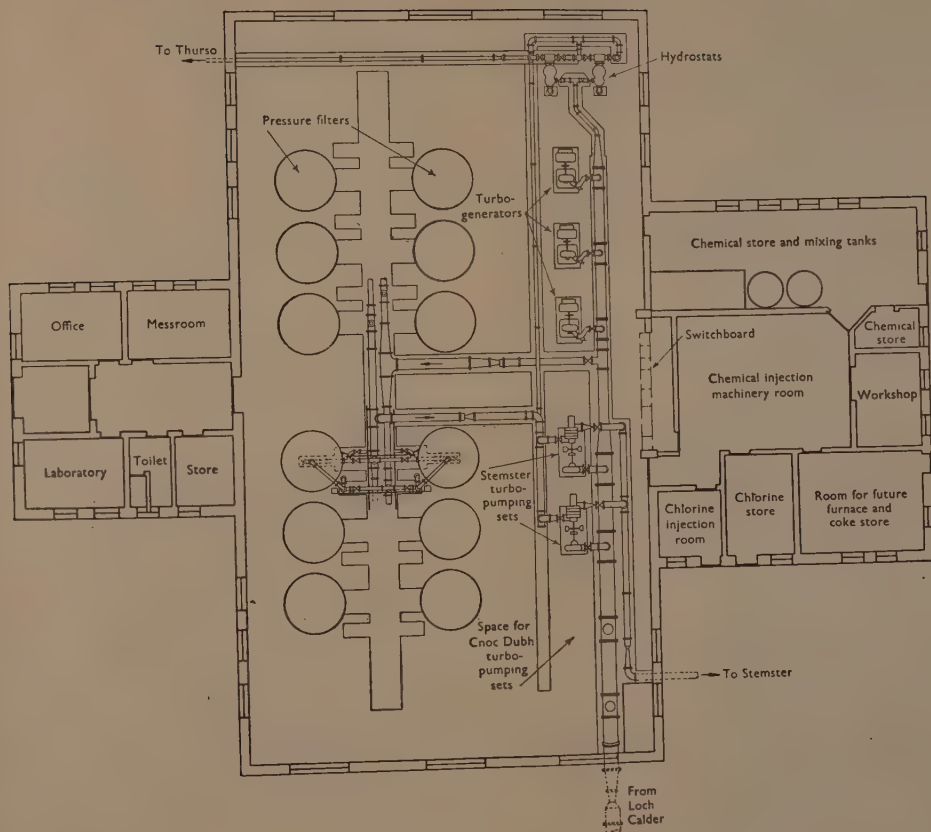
HOY PUMPING STATION—INTERNAL ARRANGEMENT
